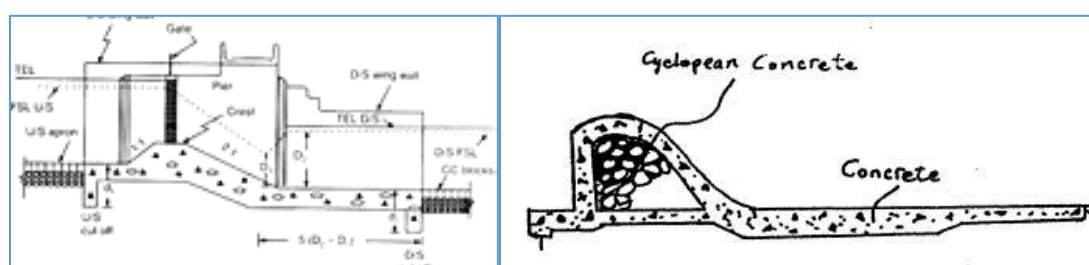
Typical longitudinal section of rcc (l) cyclopean concrete weir (r)
